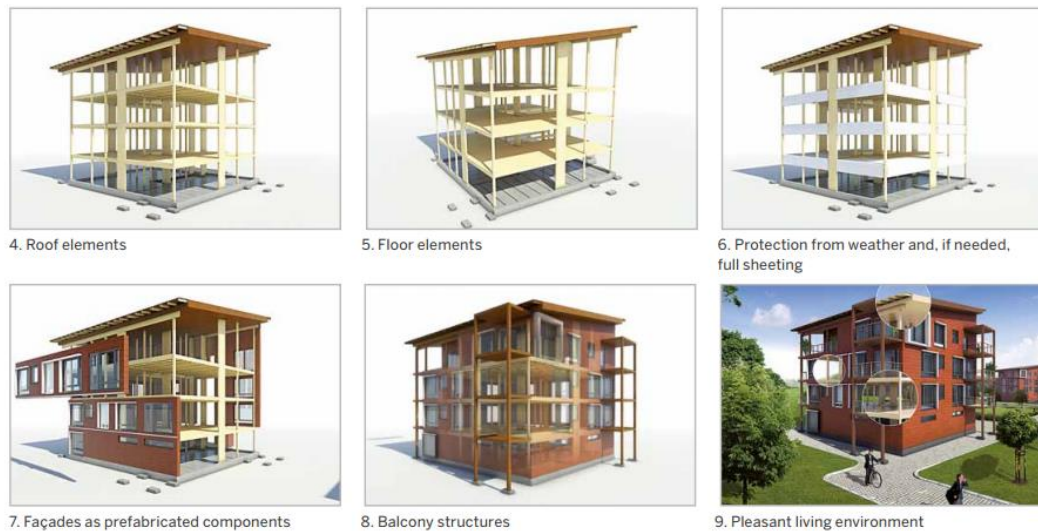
The barebone approach by MetsäWood for its in-house construction method. [71]
